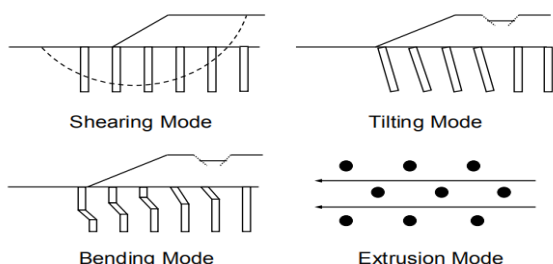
Stability Failure Modes for Embankments Supported on Deep Mixed Columns.
